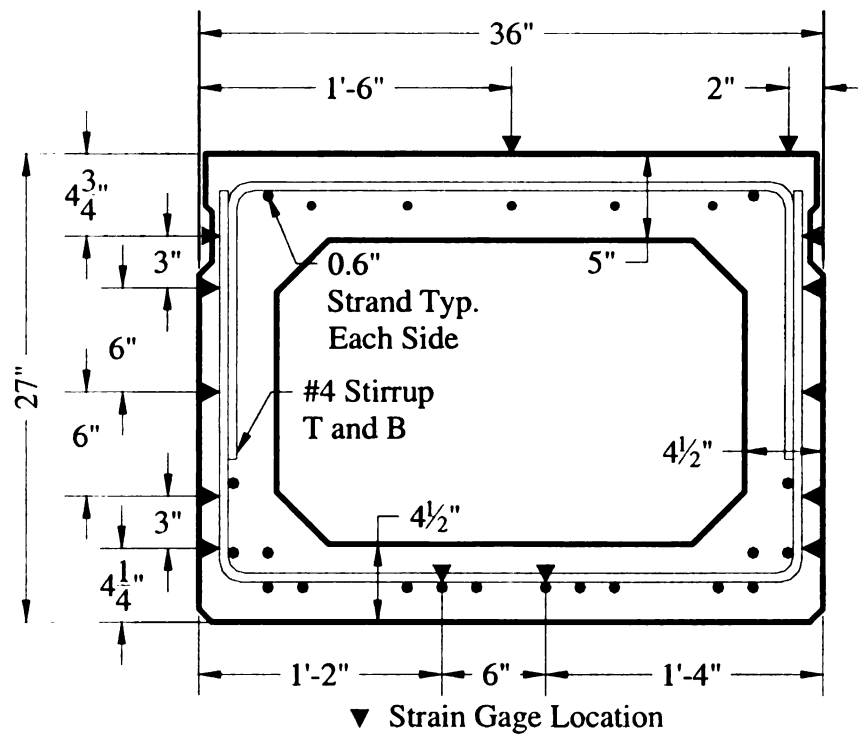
Strain Gage Locations Sections A-A, B-B, C-C
